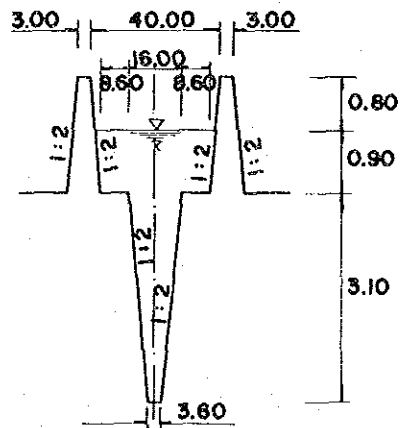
TYPICAL RIVER CROSS-SECTIONS FOR COMPREHENSIVE PLAN (4/5)
